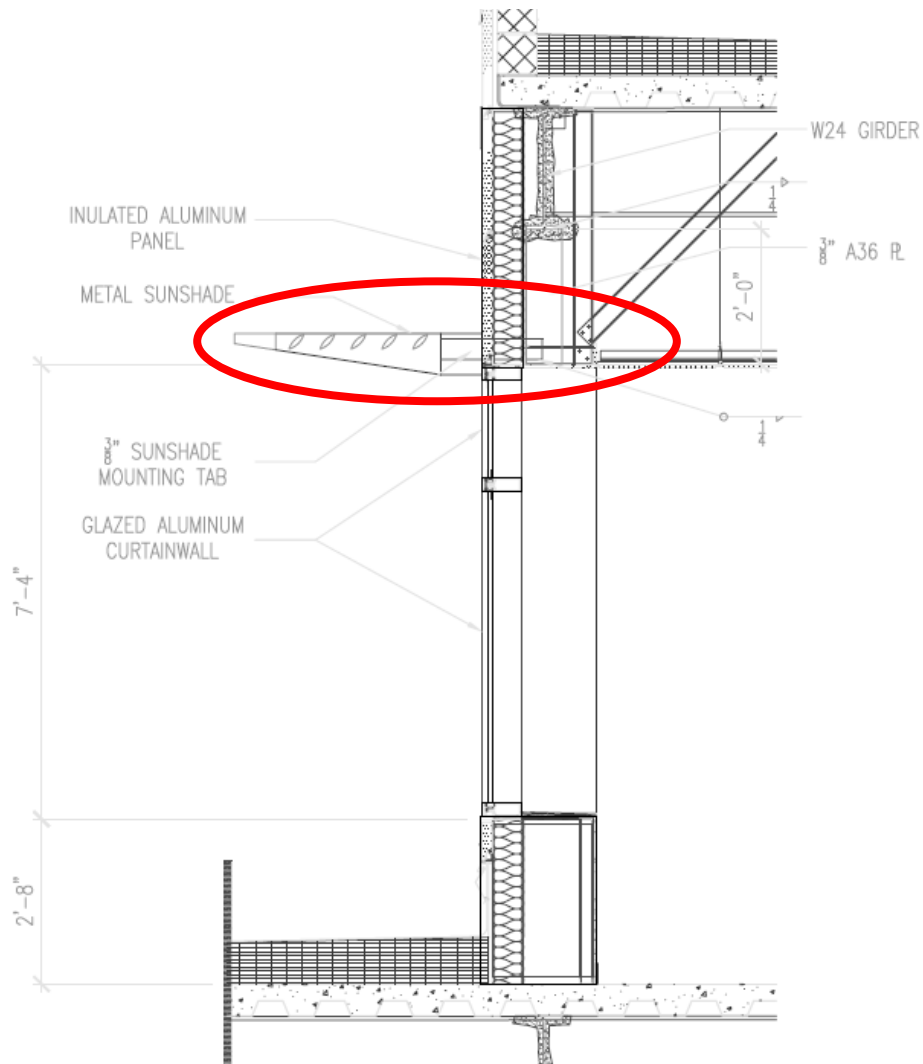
Redesigned Wall Section of 5<sup>th</sup> Floor
